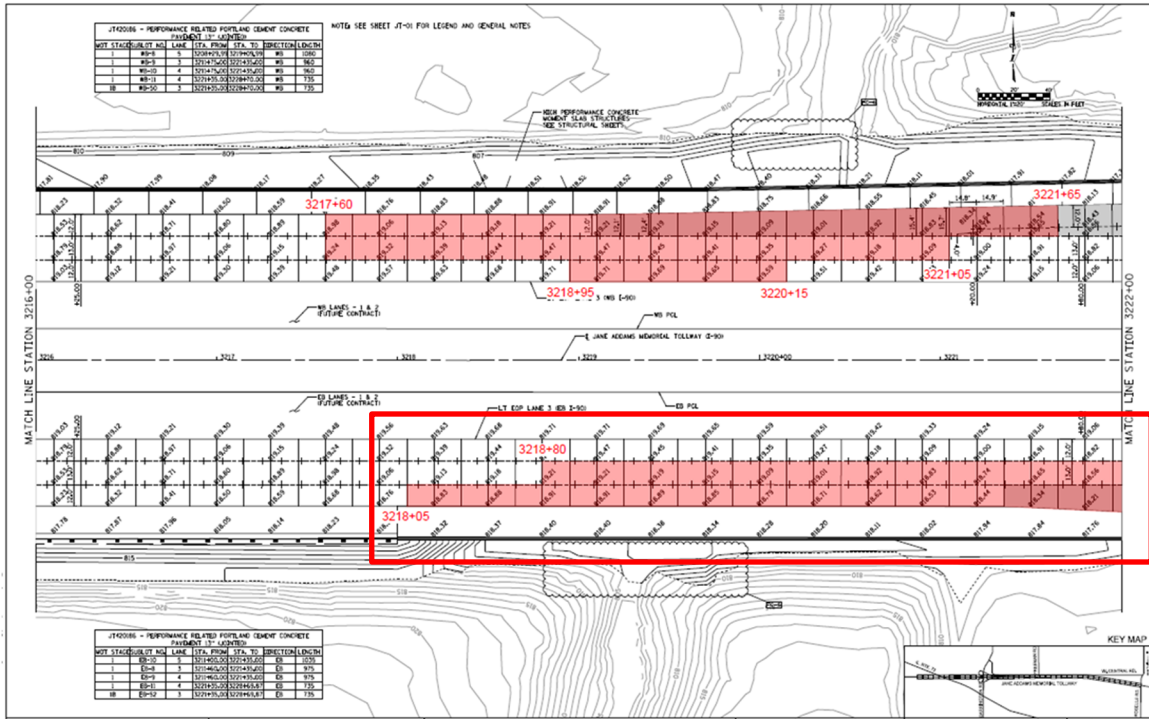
Failure locations next to Retaining Wall #4 (Station 3216+00).
